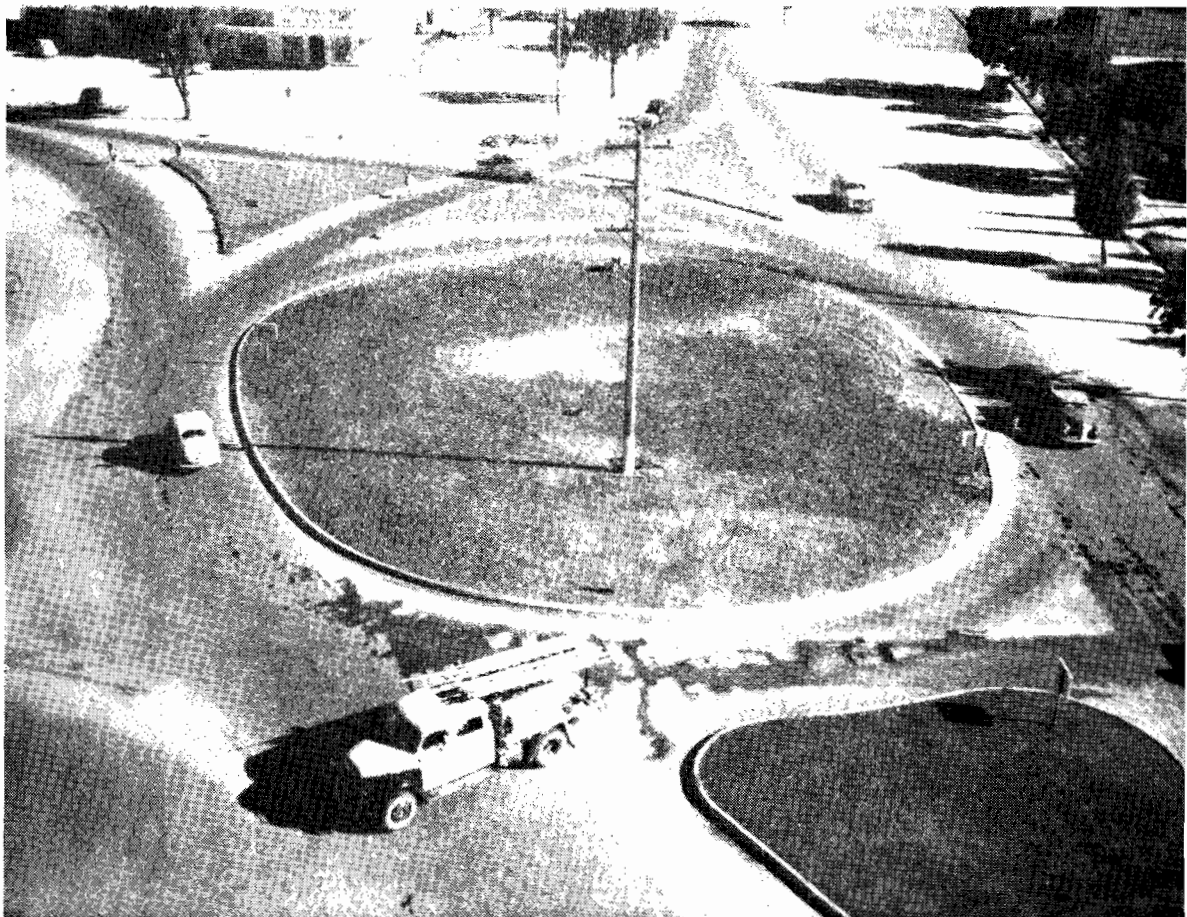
Murray Valley Highway, Section 2. Channelized intersection at Beechworth—Wodonga Road.
